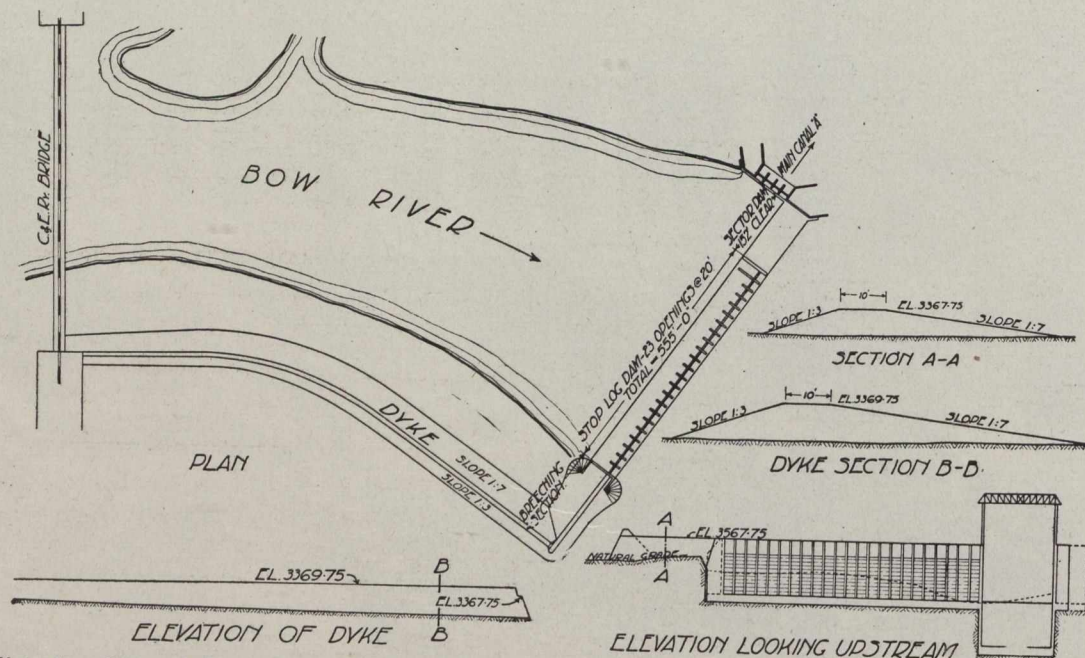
General Layout of Headworks on Bow River for the Main Canal, Western Section.
